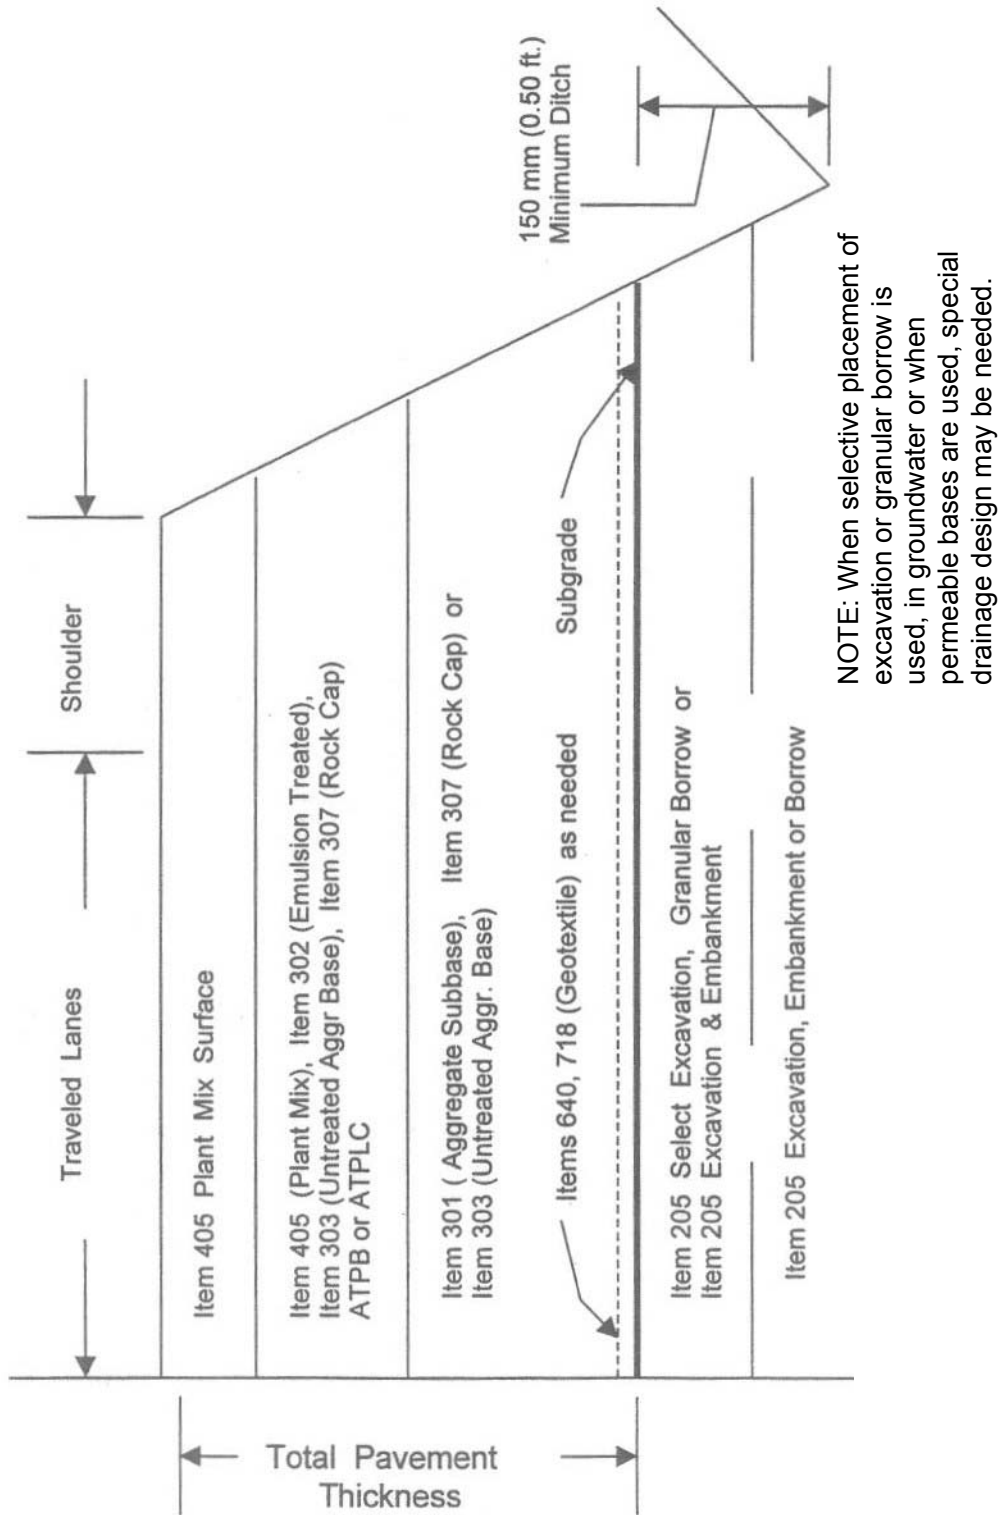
STRUCTURAL ELEMENTS OF FLEXIBLE PAVEMENTS
